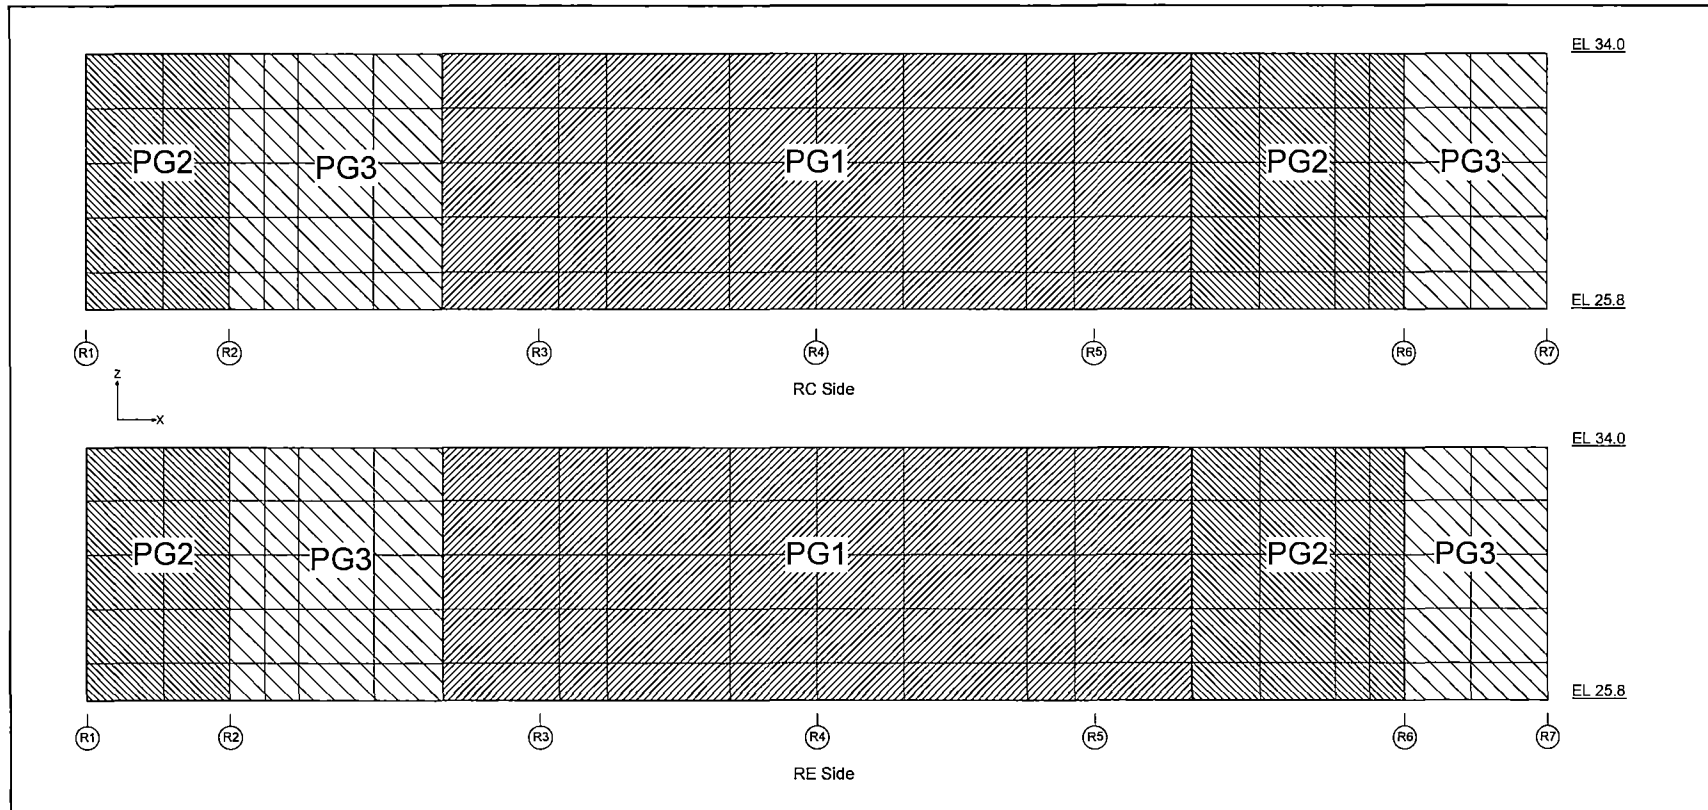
Application of Thermal Load on the Pool Girder
